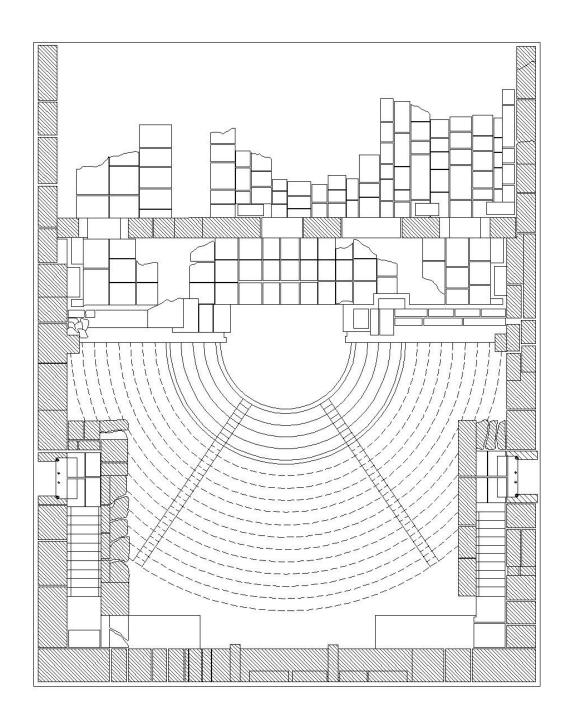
Plan layout of Bouleuterion (Archeological excavation reports)
